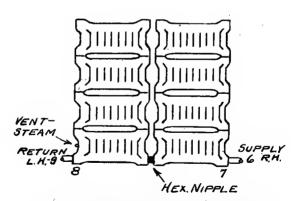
Assembled in two or more stacks. One and two pipe steam only. Bottom feed only.
